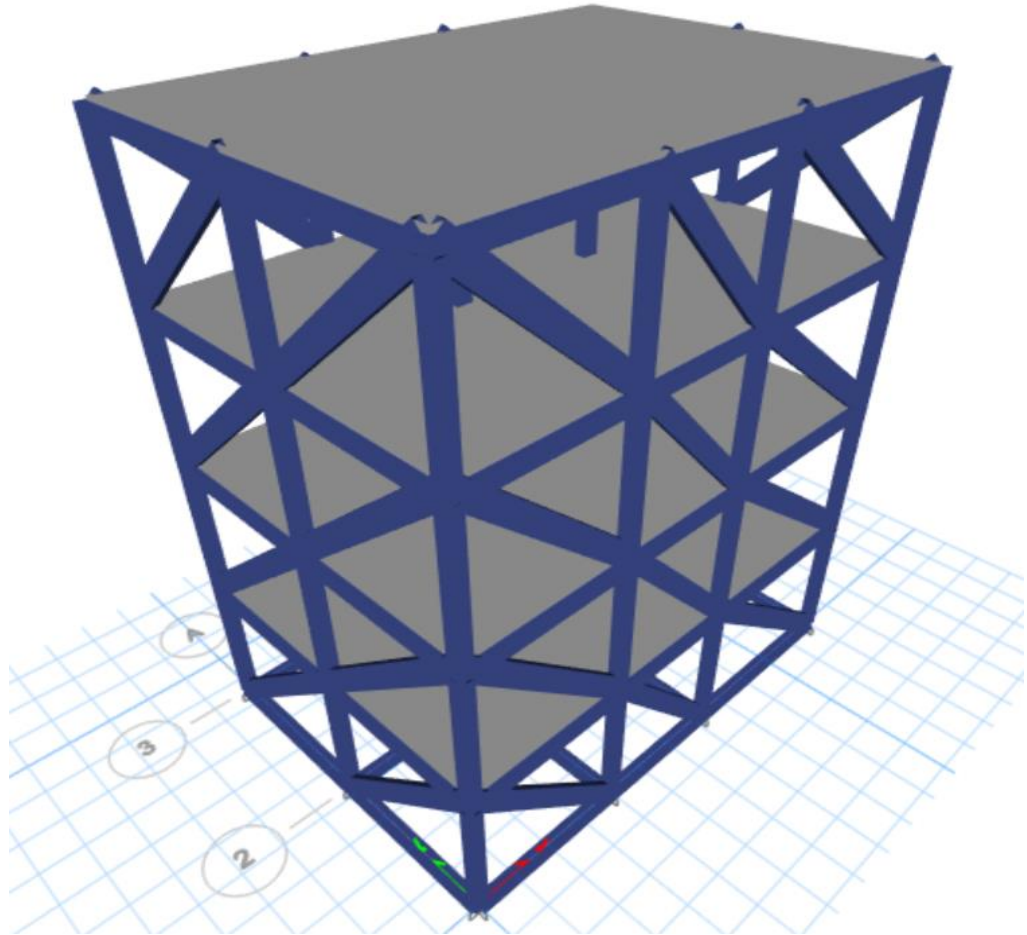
Rendering view of CMS with wall modeled as a single diagonal strut
